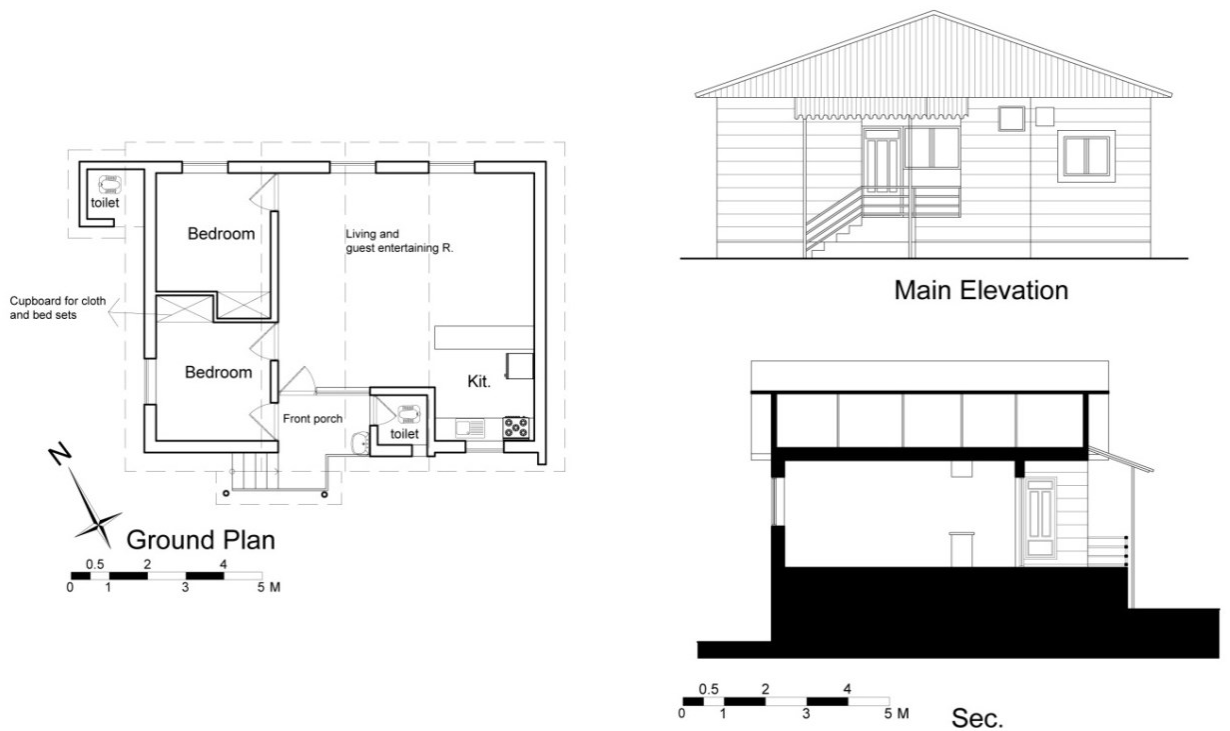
Middle style house (sample no.16 in Diva) _ one story with bricked load bearing wall
